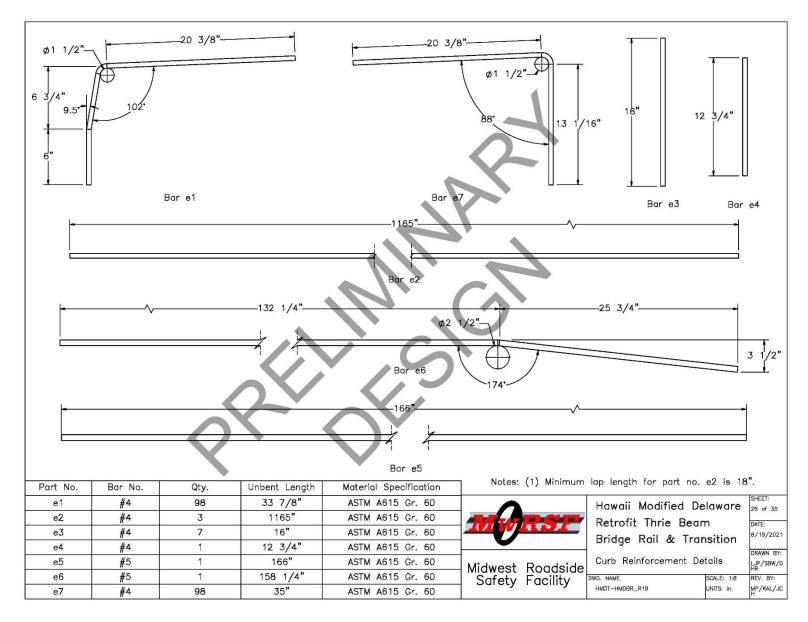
Curb Reinforcement Details, Test No. HMDT-1
